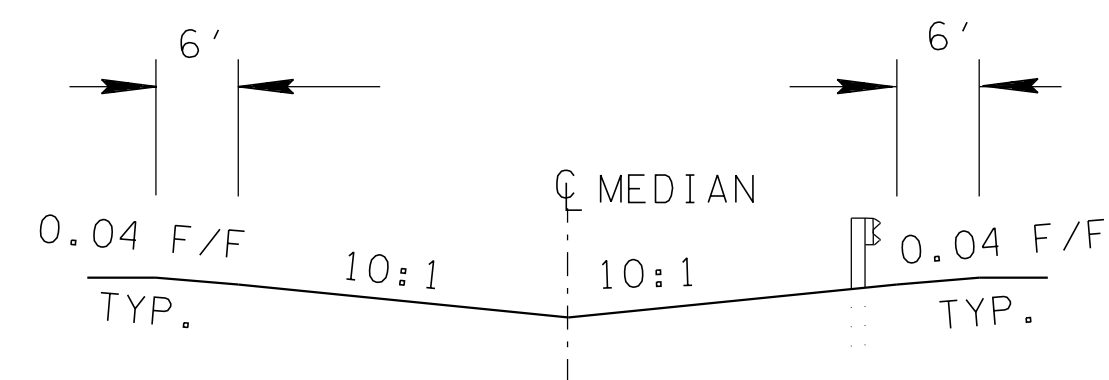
Typical cross-section of a 10:1 embankment. The diagram shows a cross-section of an embankment with a central median. The embankment slopes are 10:1. The top width of the embankment is 6 feet. The median width is 6 feet. The embankment is labeled "TYP." and "10:1". The median is labeled "MEDIAN". The embankment is labeled "0.04 F/F".
